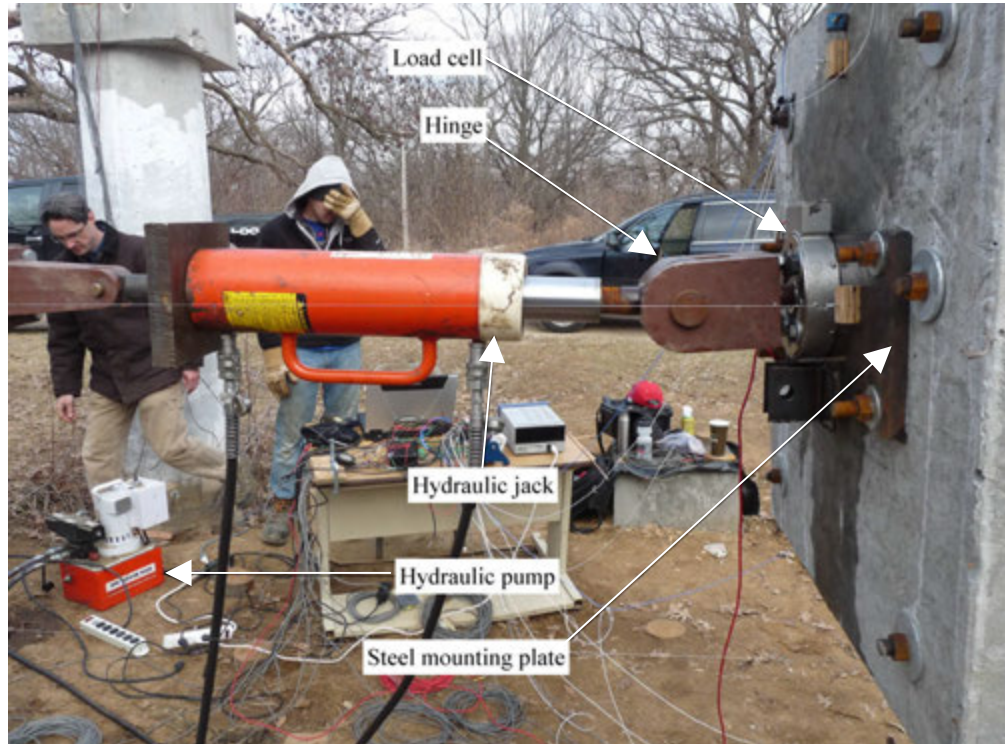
Hydraulic jack attached between steel assembly and pile cap.
